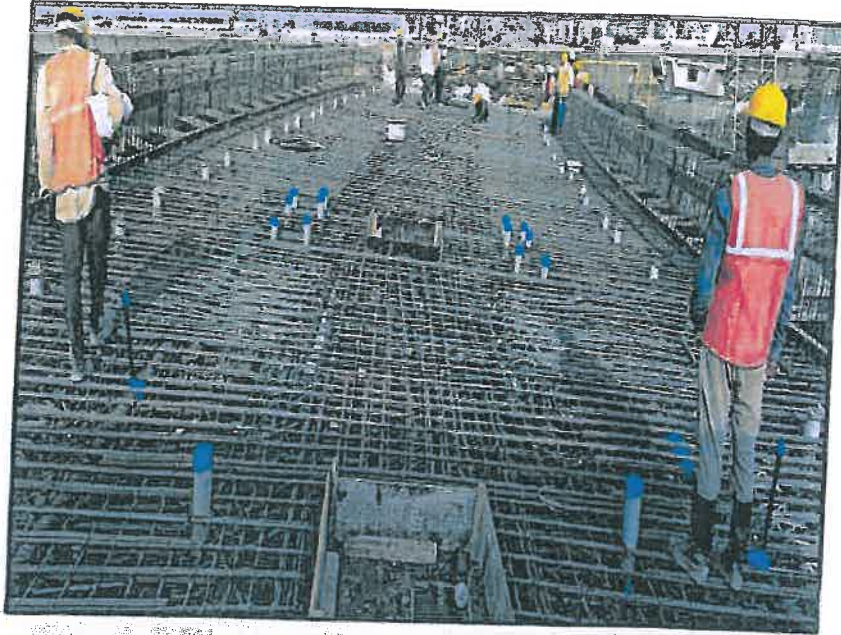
Ramp CA- Top slab side formwork alignment in progress at Span CAP-4 to CAP-5.
